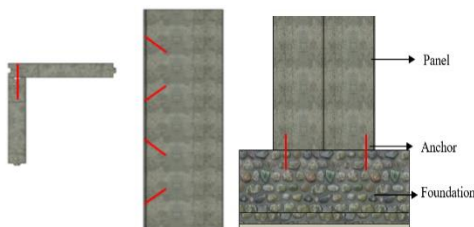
Corner and Panel to Foundation Connections from Independent Modeling
